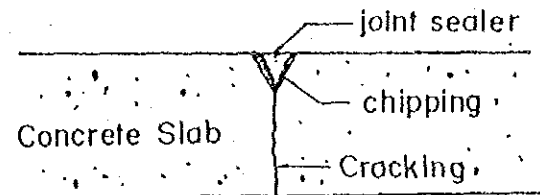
Example of Injection for Longitudinal Cracking
